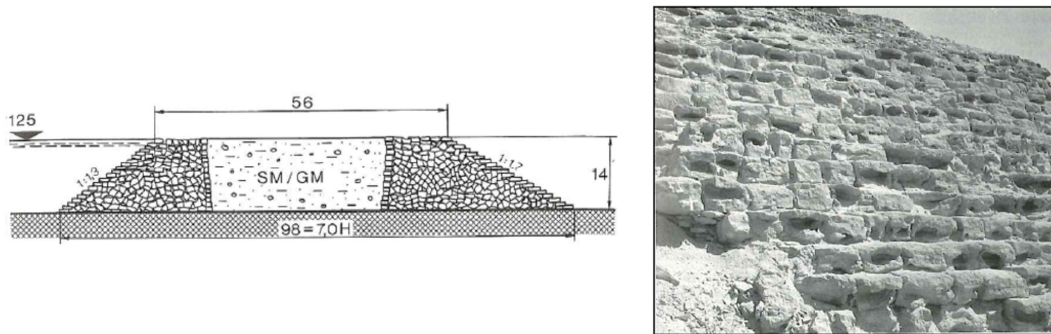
Sadd-El-Kafara dam: cross section on the left and its dry-stone pitching on the right [12]
